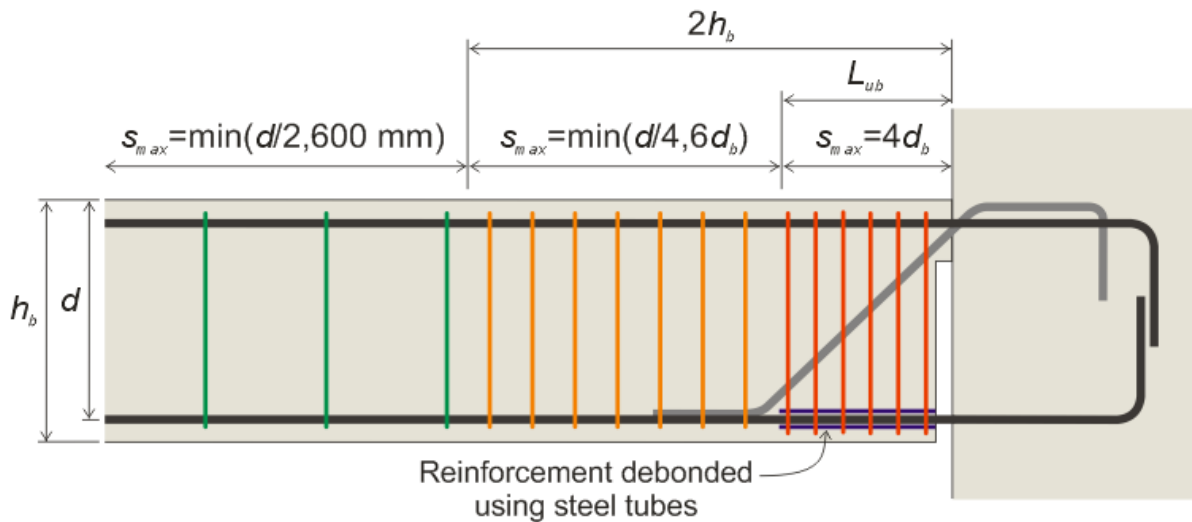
Recommended maximum stirrup spacings for anti-buckling in slotted-beams
